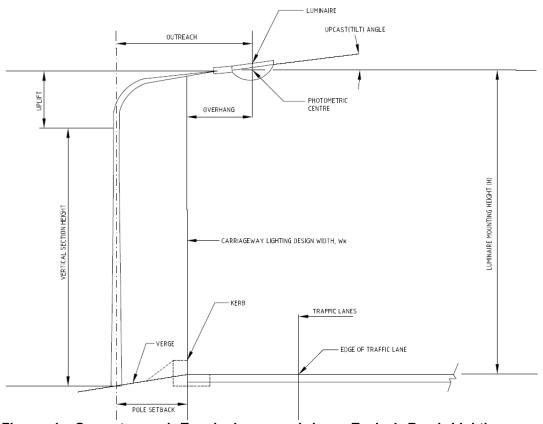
Geometry and Terminology used in a Typical Road Lighting Installation
